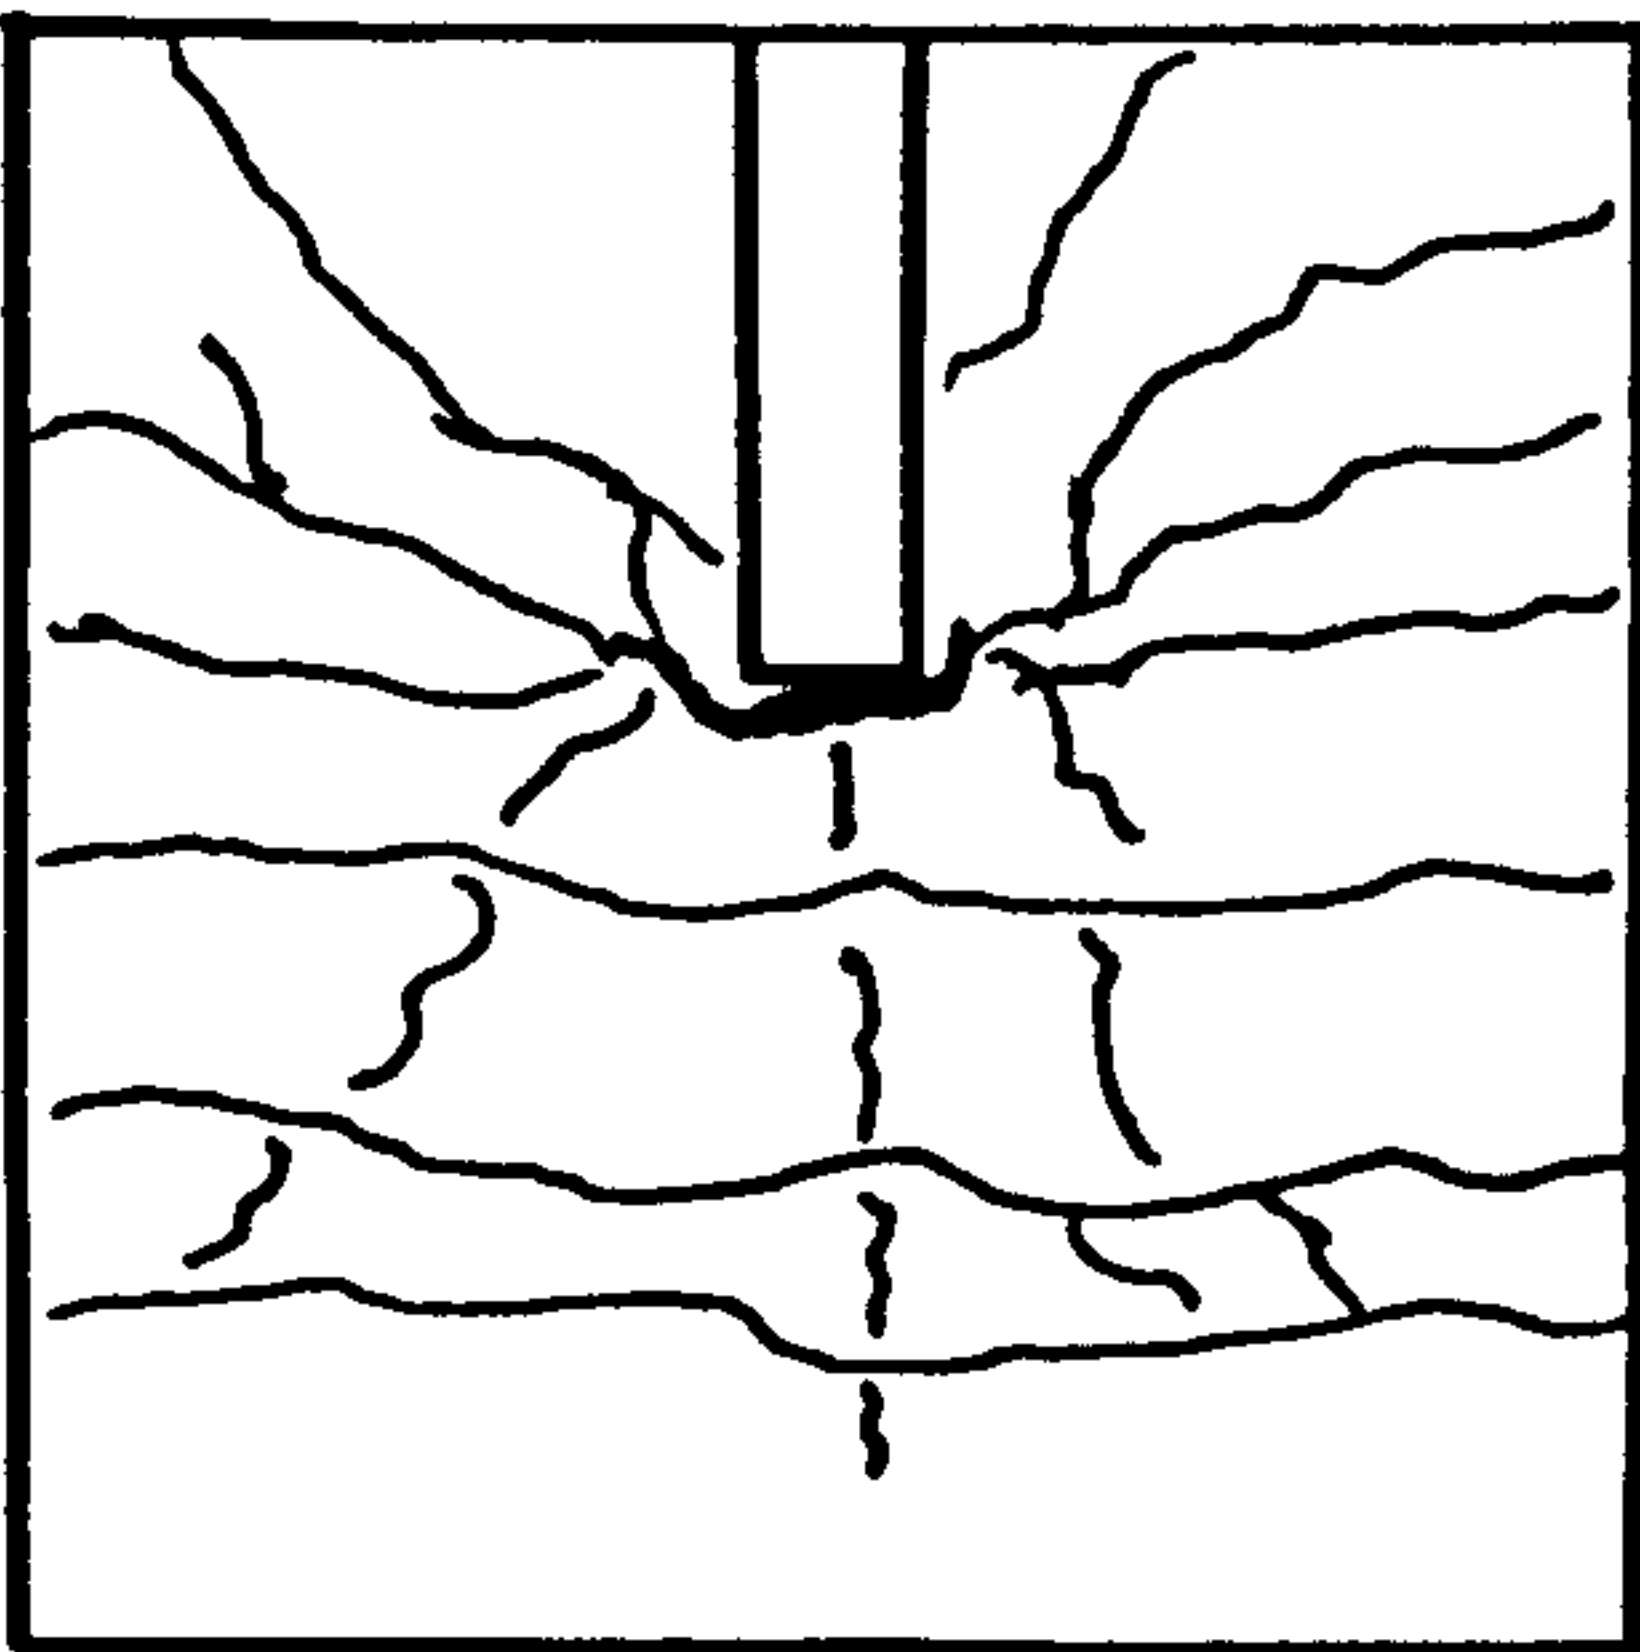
Crack pattern of slab of PT1 just before failure.
